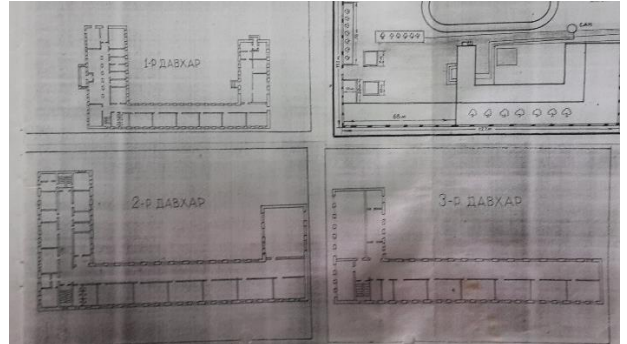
Internal walls - are continuous for classroom block along the bottom of the page but vary between floors for left hand block, with several discontinuing above entrance hall.
